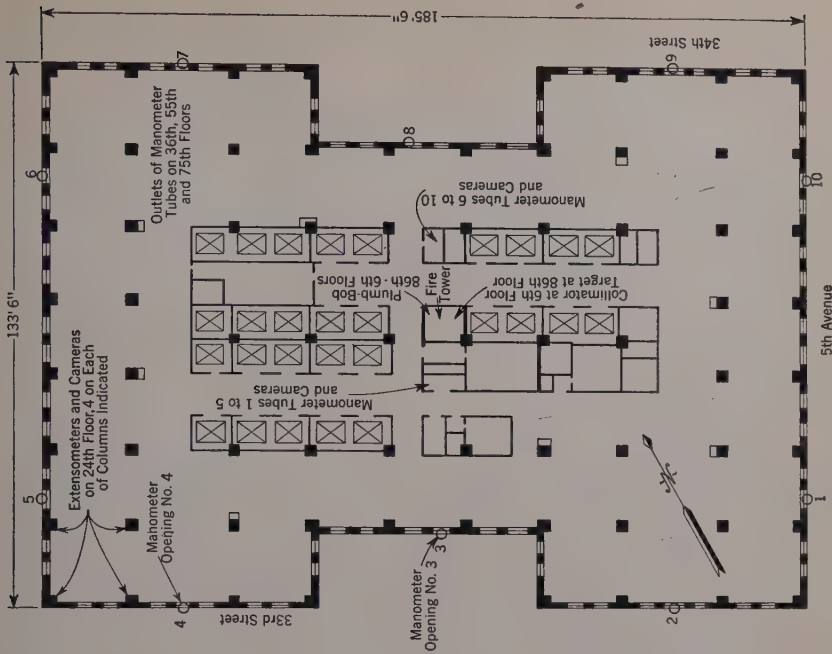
TYPICAL FLOOR LAYOUT. NUMBERS DENOTE OBSERVATION STATIONS
